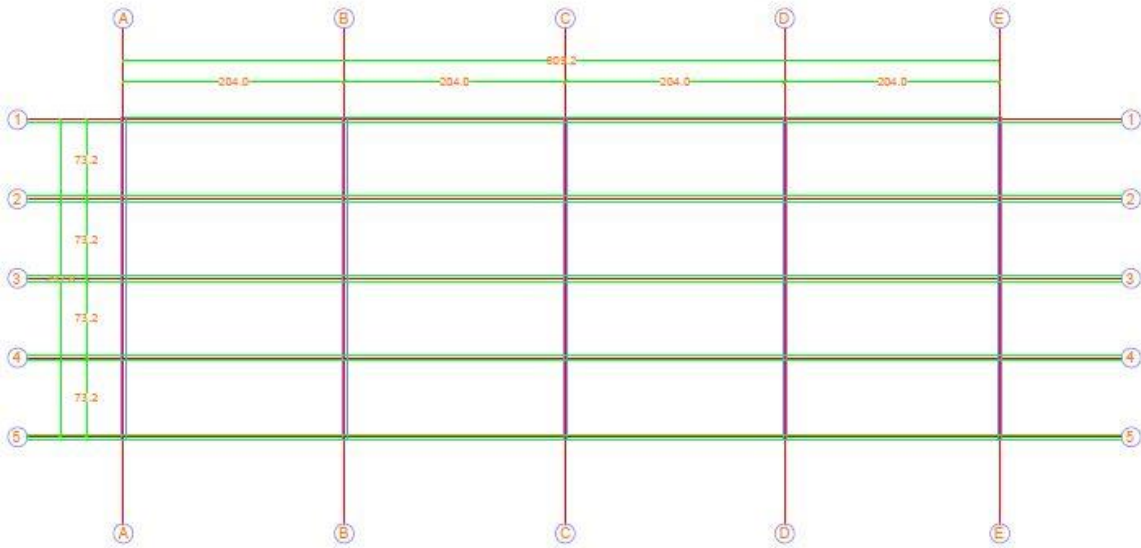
Solar panel Plan in Autocad (Dimensions in centimeters)
